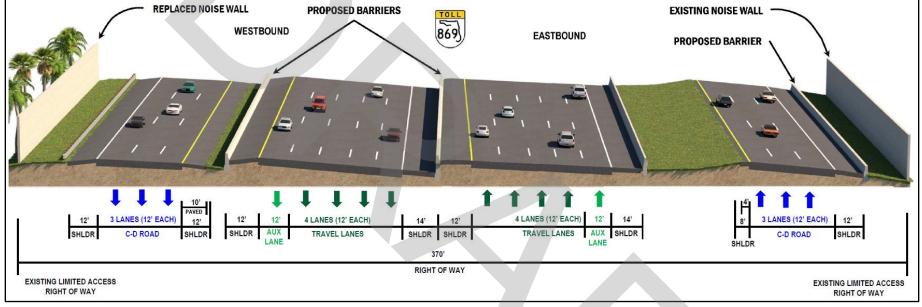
Preferred Alternative Roadway Section between Lyons Road and Florida's Turnpike
